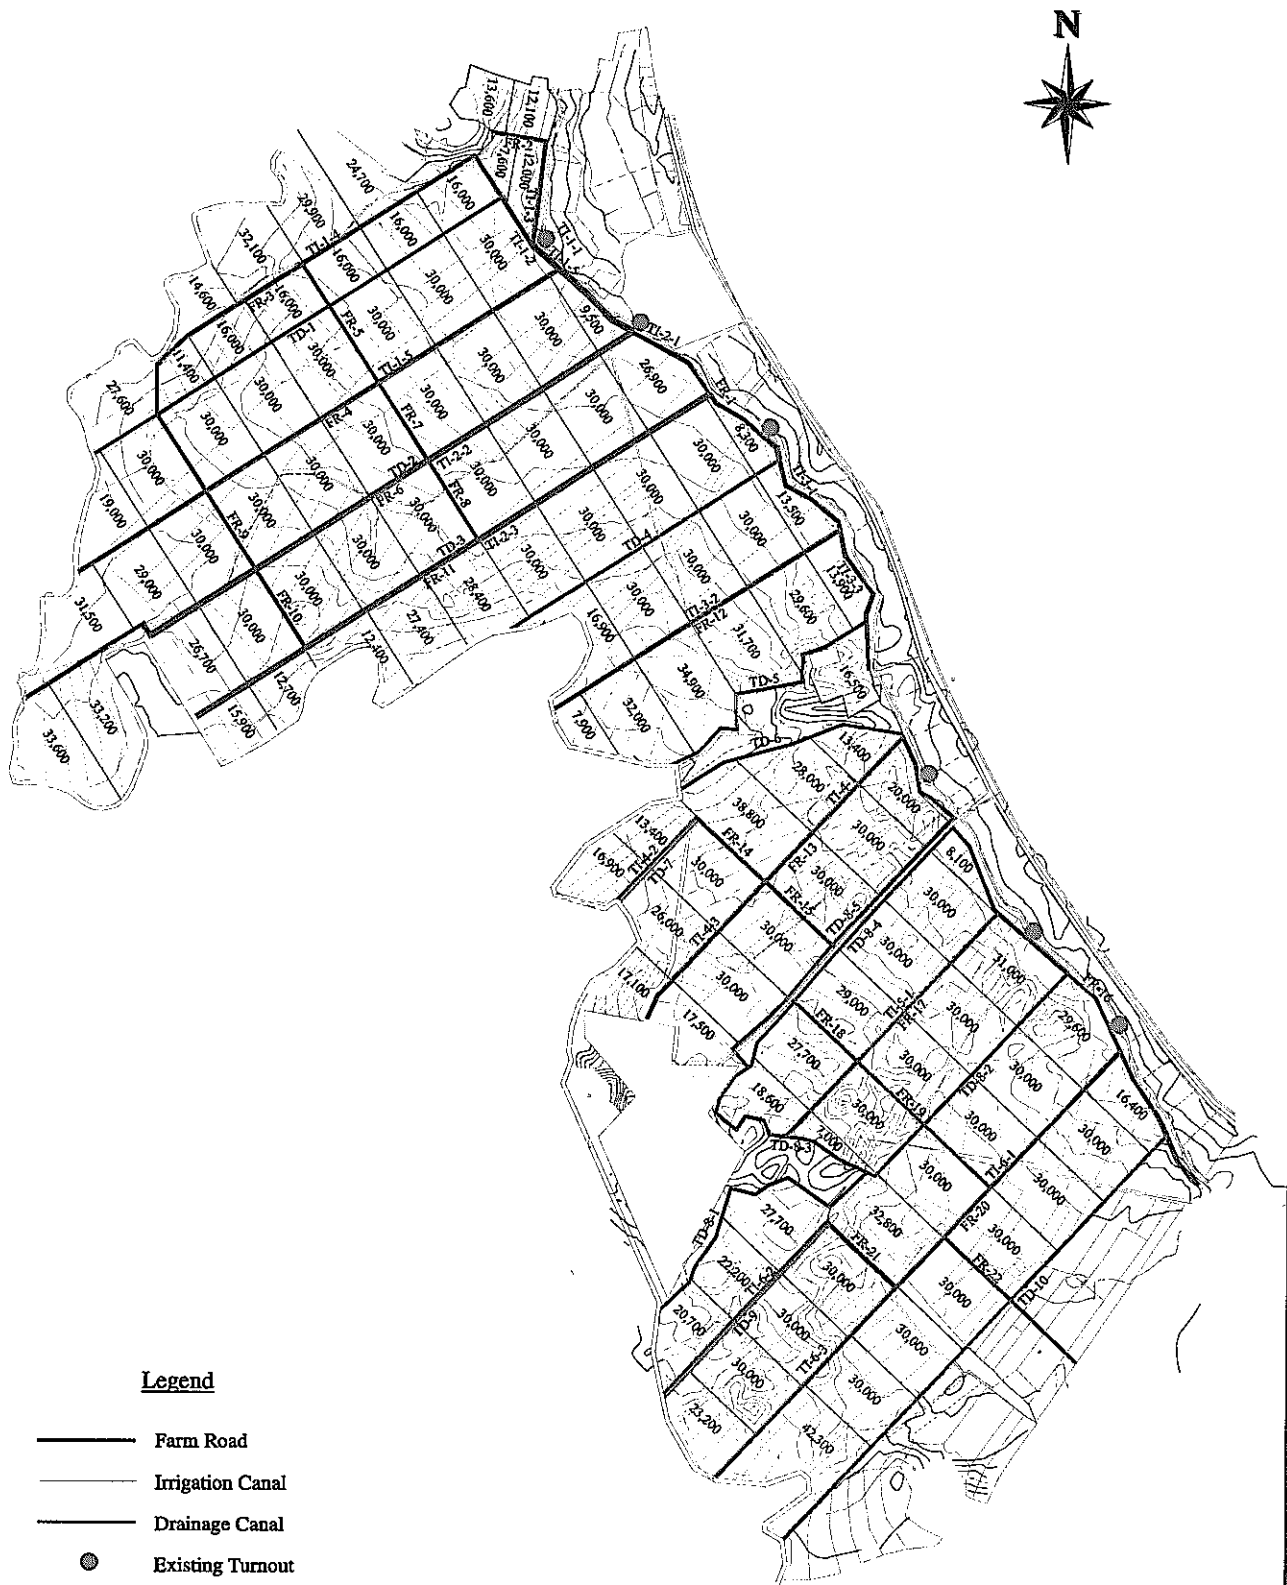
Land Consolidation Plan Around Khoram Abad
